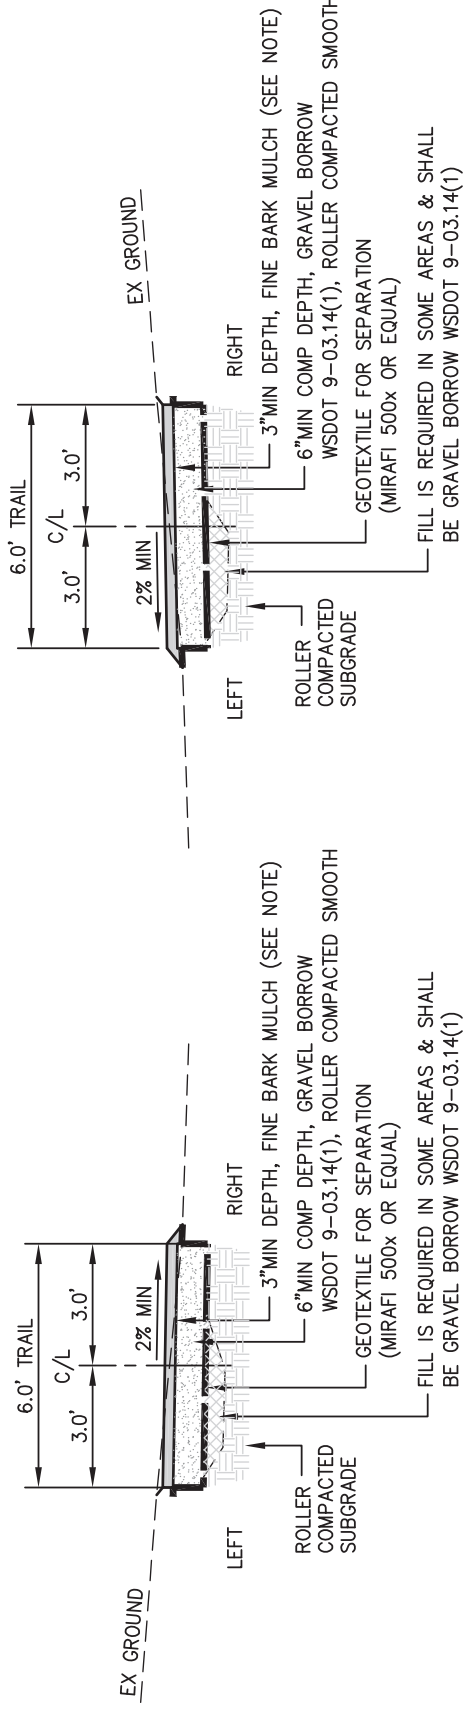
CONCEPTUAL TRAIL PLANS
